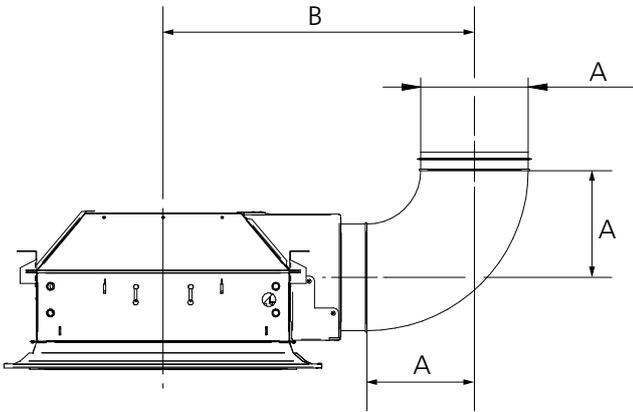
Dimensional drawing, long side connection with bend Ø125/160/200
